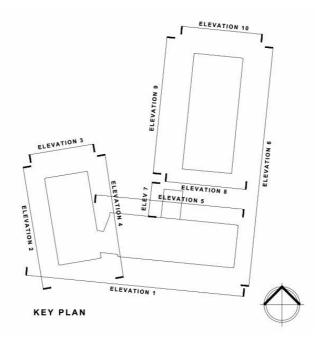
Elevation Key Plan - drawing 1600529.2.20 Drawn by AC by Marrons Planning
